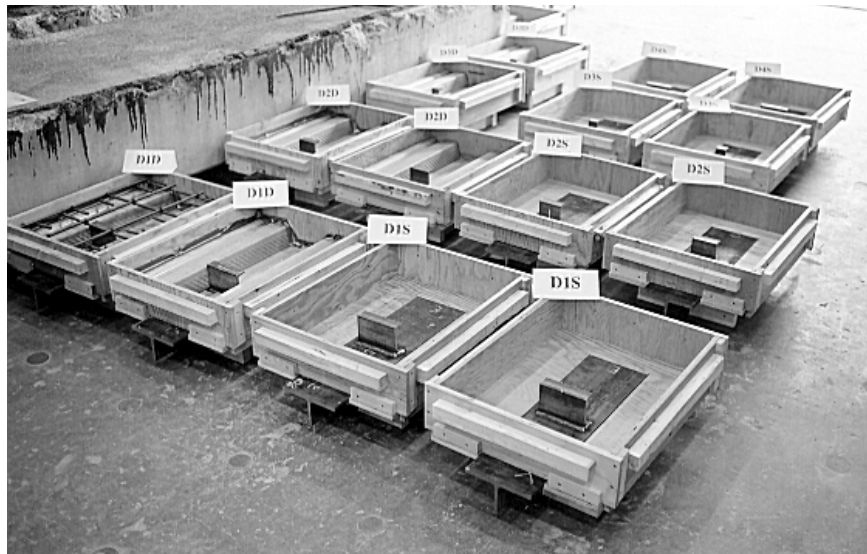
Pouring of concrete slabs: Phase 2 specimens.
